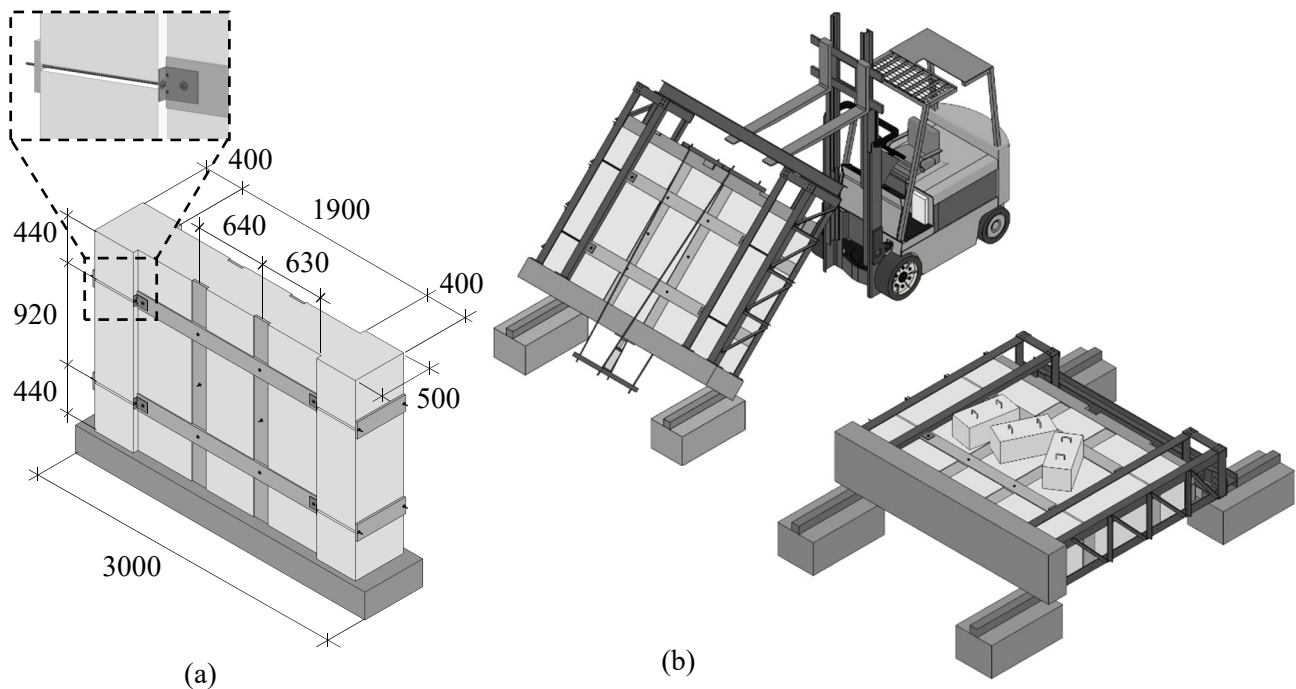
Overturning tests for adobe walls retrofitted with timber planks: (a) specimen geometry; (b) testing setup.
